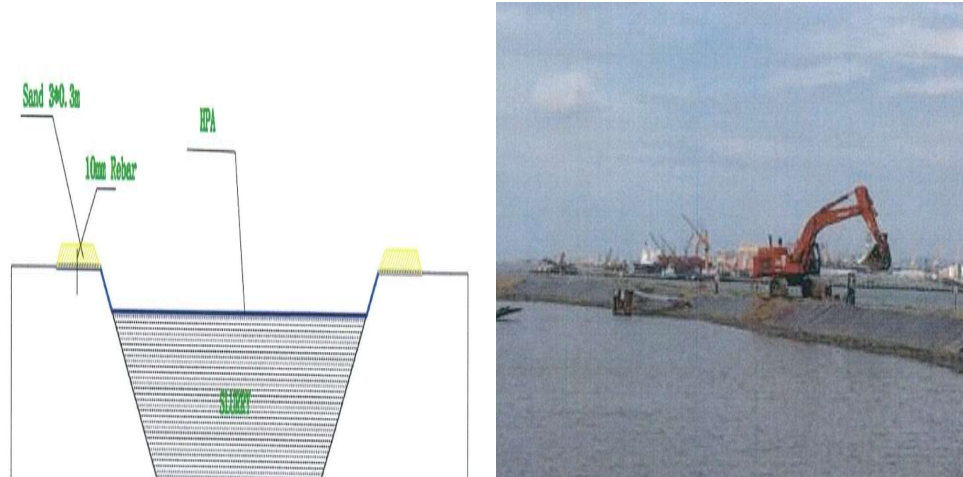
Installed geotextiles secured into position with rebars and sand berms
